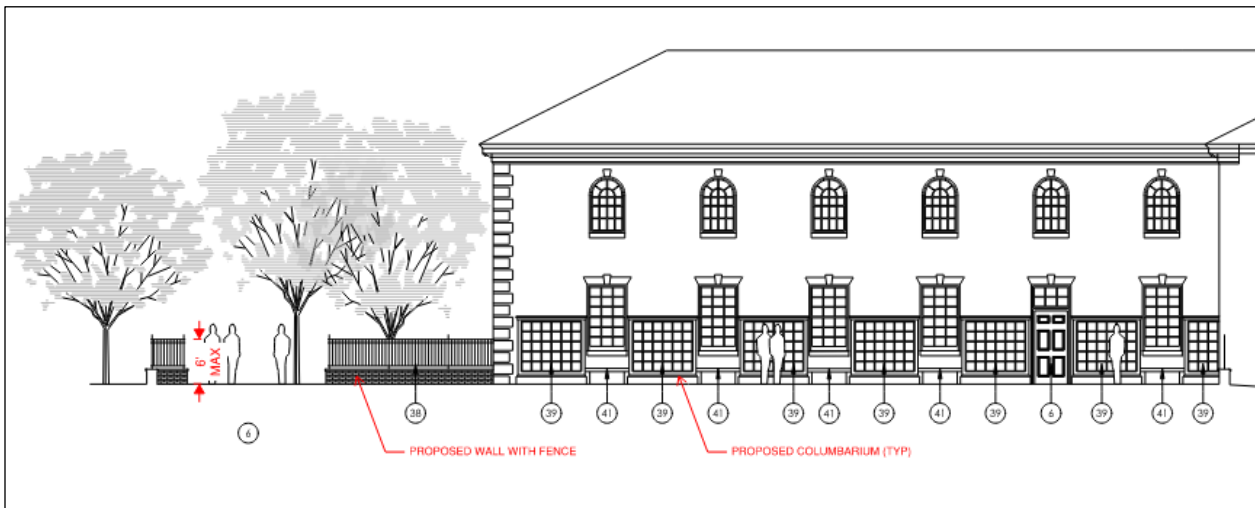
Rendering of south elevation showing proposed columbarium and fence locations
